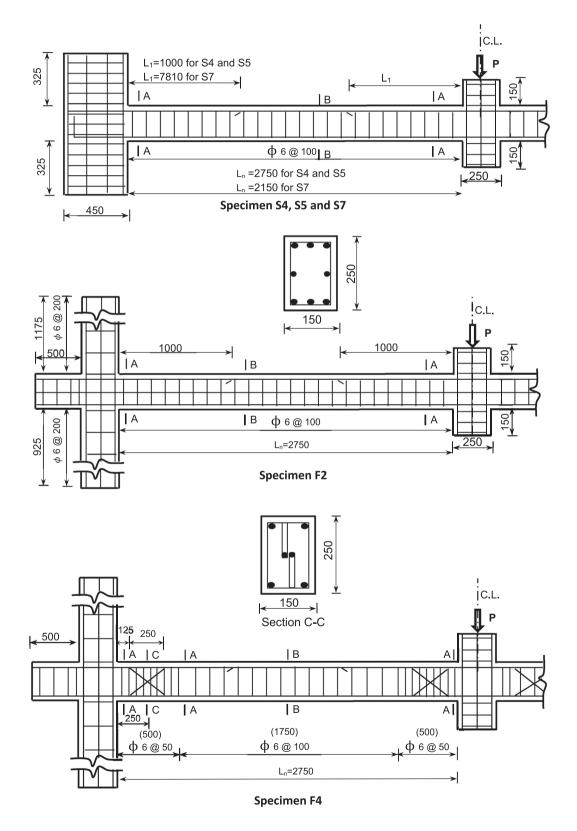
Geometrical details of RC beam-column sub-assemblages and frames by Yu and Tan [28,32,39].
